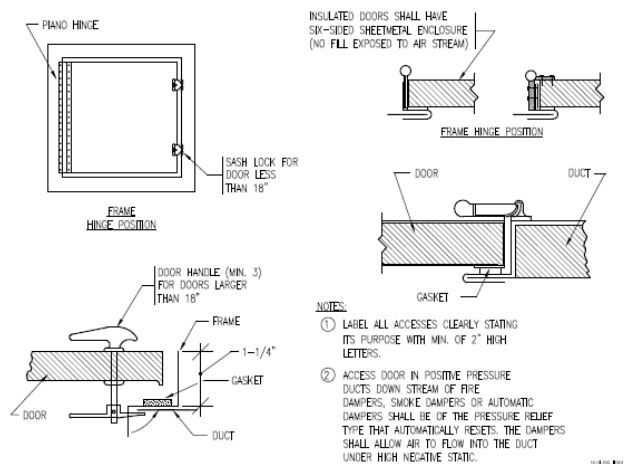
Duct Access Doors Detail (courtesy BR+A)
